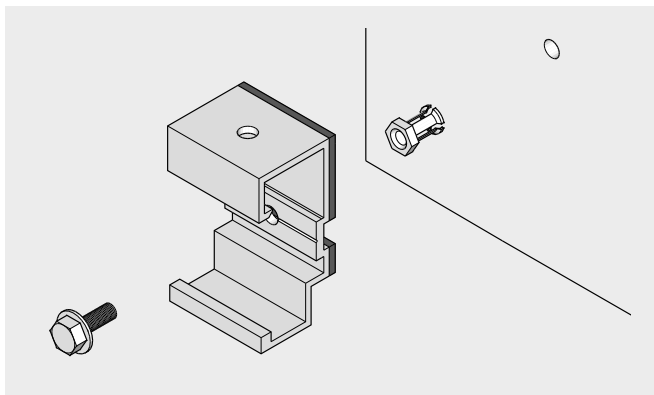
| Concealed Fastener | Undercut Anchors | Into Panel Back
